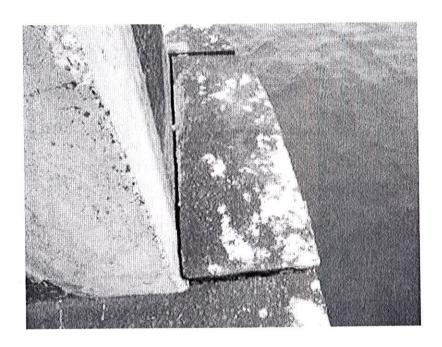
Photo 52 Appendix D Top Stones at Southwest Corner of Pier 12, Displaced from the Pedestal
